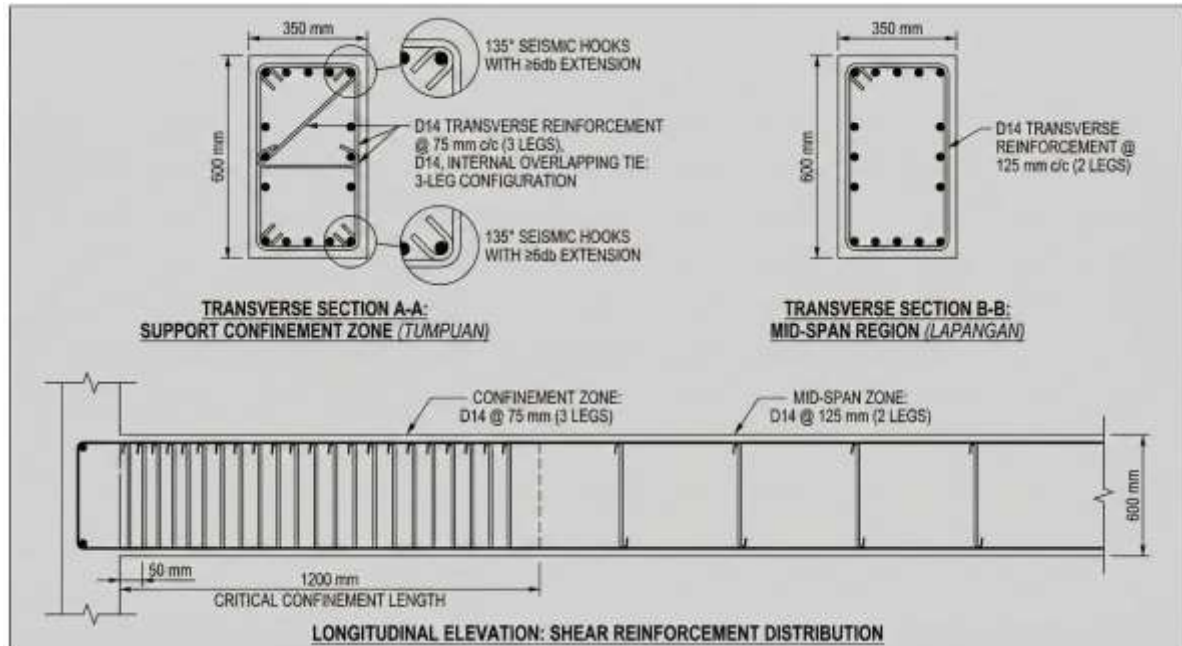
Details of Sliding Reinforcement (Sengkang) and S1 Sloof Hooks
